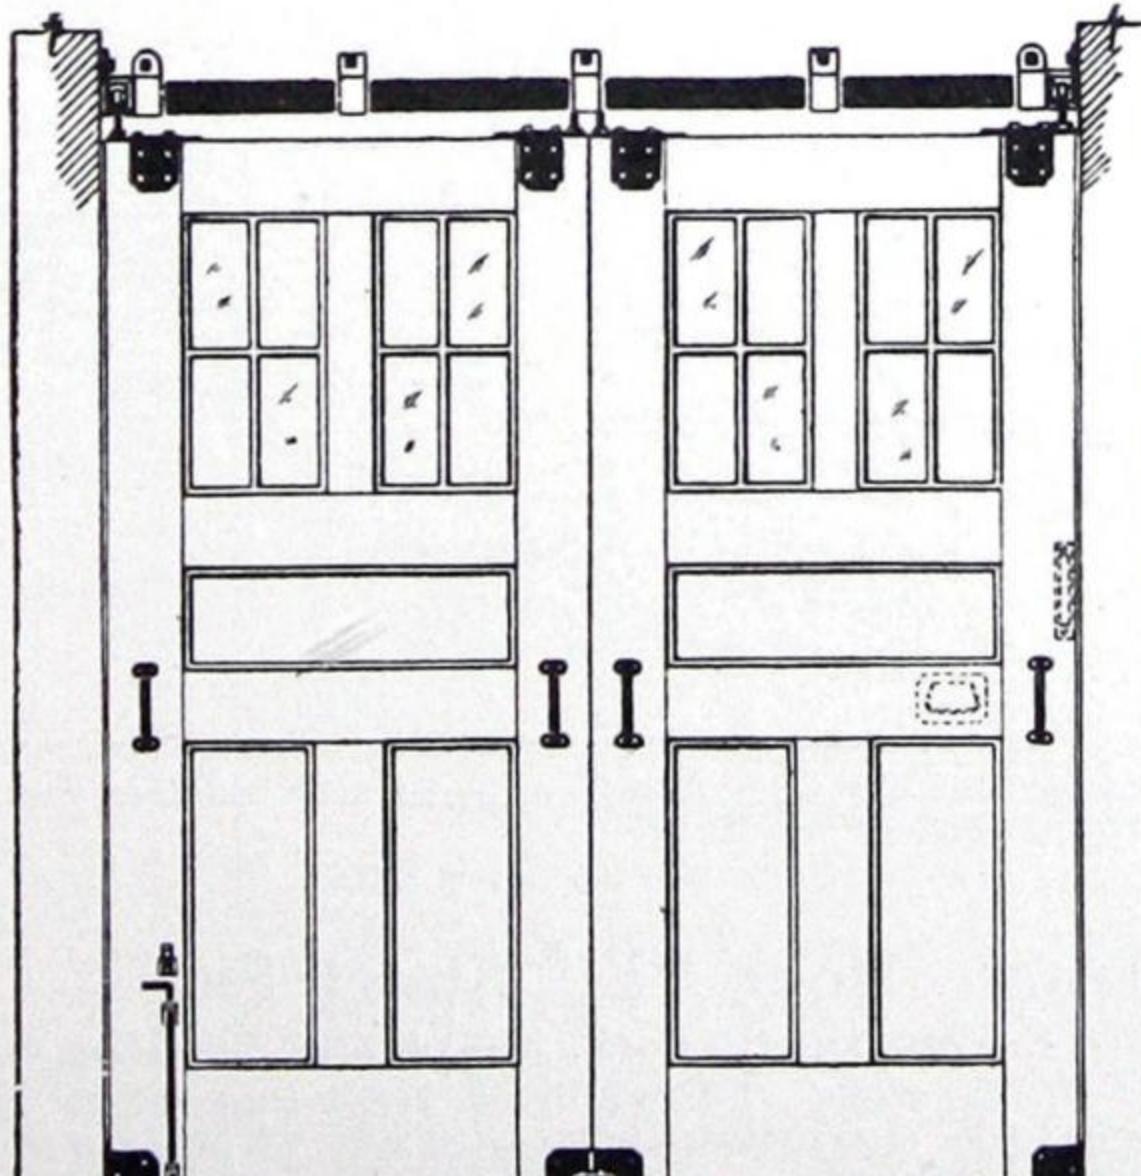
Interior elevation showing Set DD-4, including one 524 Cane Bottom Bolt and one 825 Door Lock.
